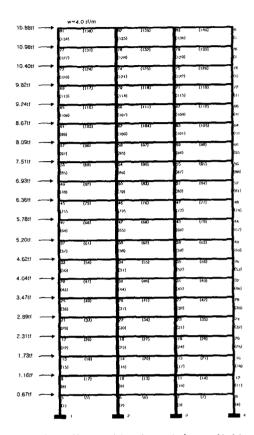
, 3-bay, 20-story reinforced concrete frame subject to gravity and lateral load (span=9m, story height=3.6m).
